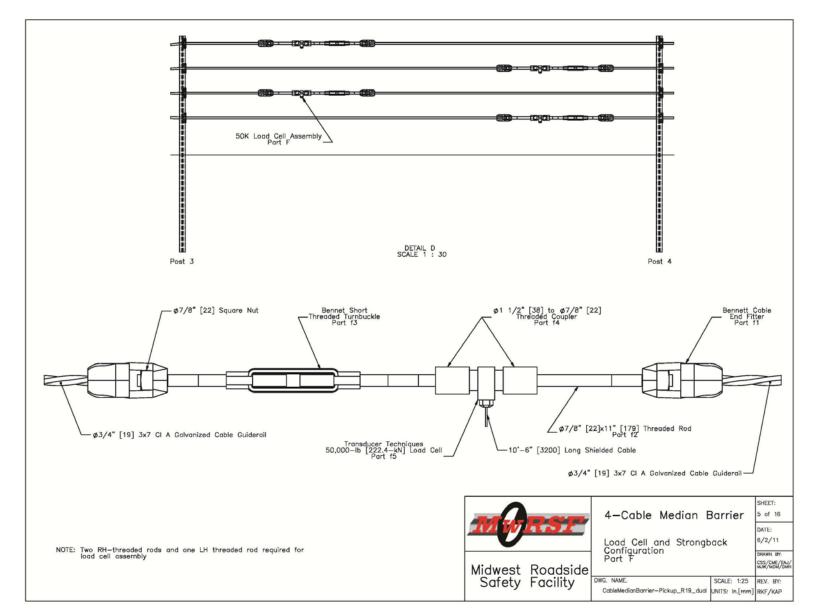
Load Cell and Strongback Configuration, Test No. 4CMB -1
